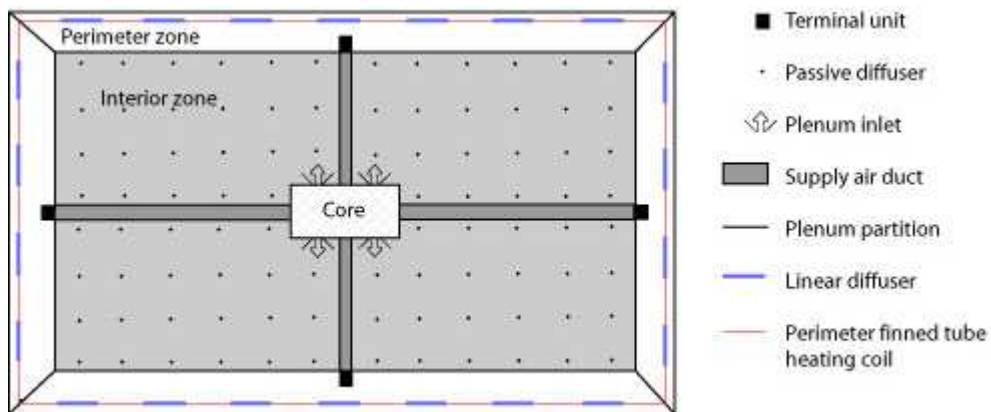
Multizoned, Limited Perimeter Ductwork System's plan
